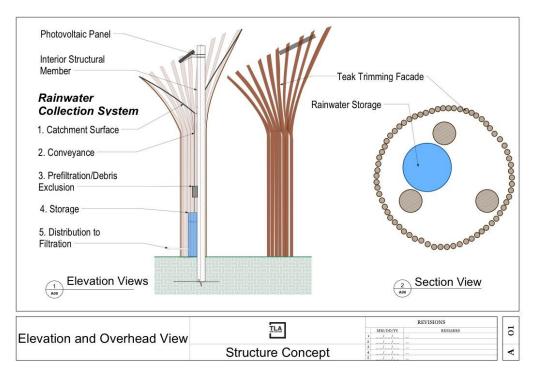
Elevation and Section Views of structure concept. (Konsko, 2017)
